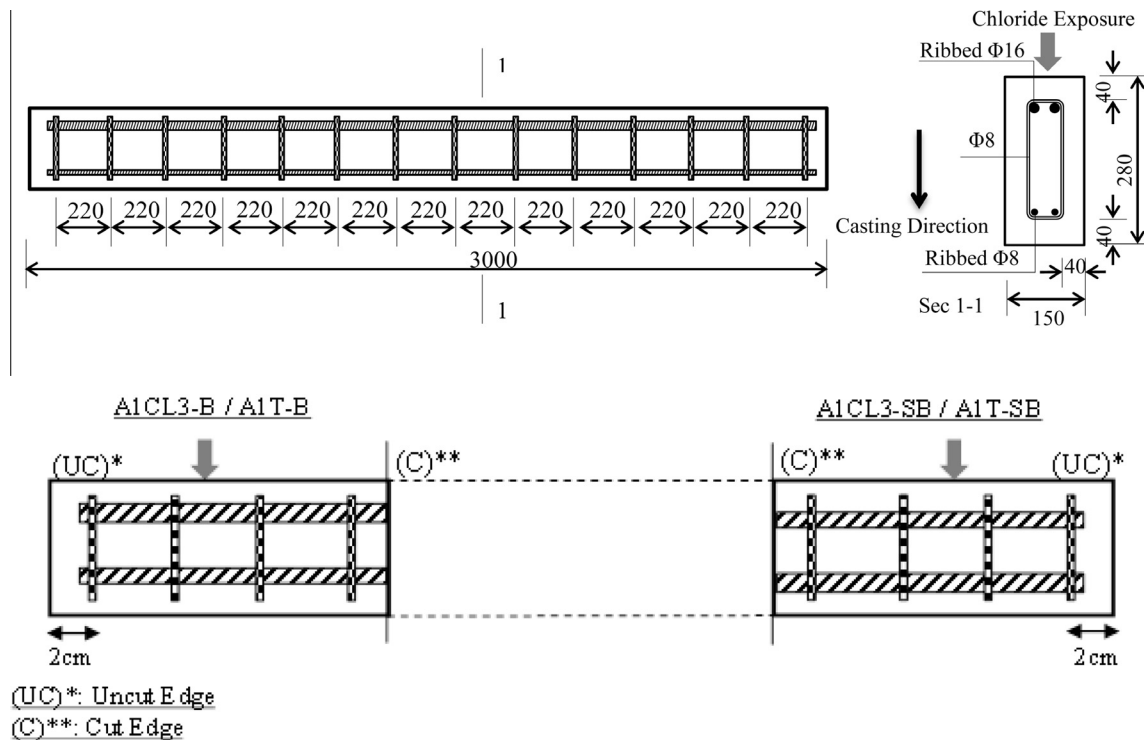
Reinforcement layout all beams. Dimensions are in mm.
